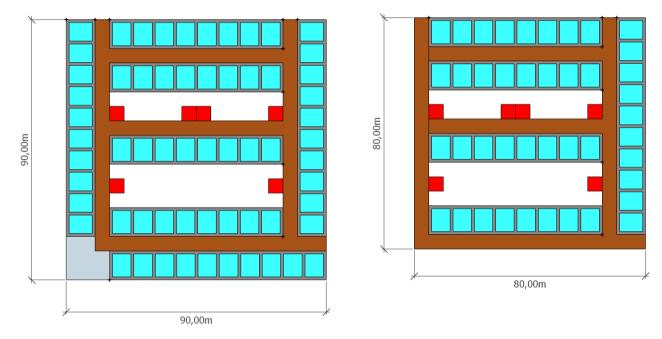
Floor plan of the top two floors (left) and the lower two floors (right)
